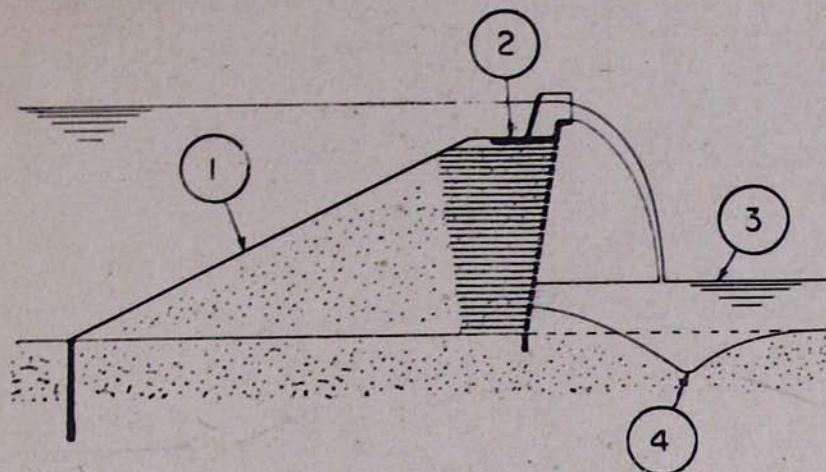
Section of an overflow Reinforced Earth dam. 1—Watertight facing; 2—Concrete apron; 3—Tailwater level; 4—Depth of maximum scour hole.
